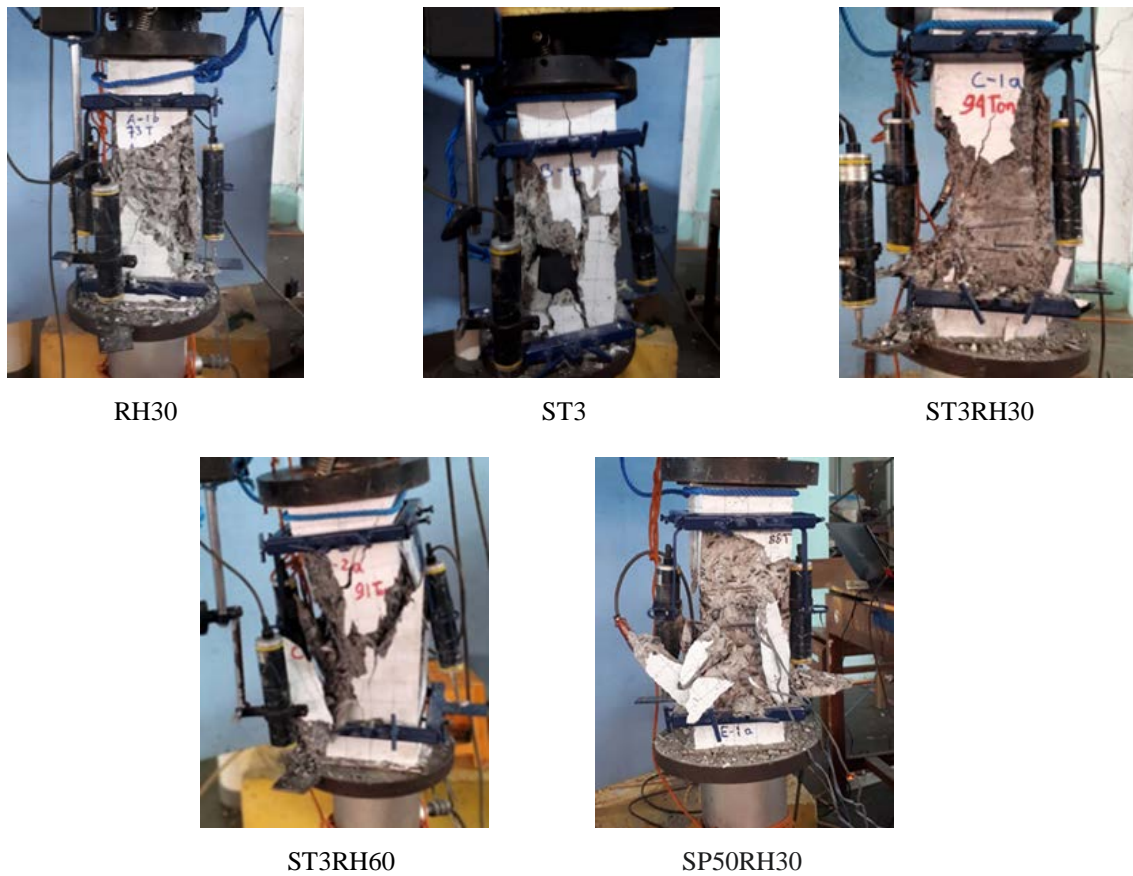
Failure modes of the compressive test specimens at the end of the test
